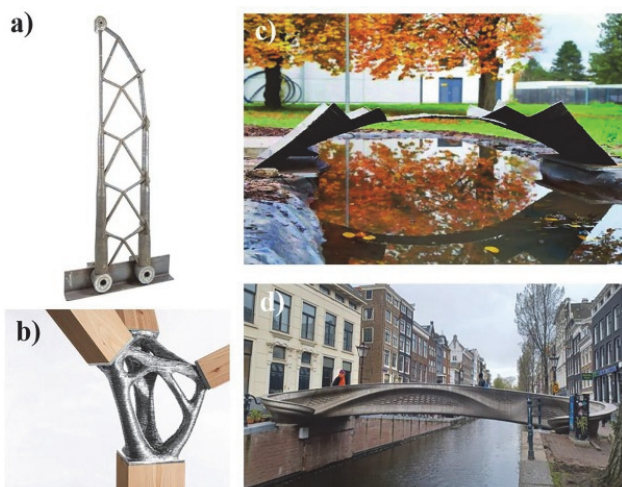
Successful examples illustrating the potential of WAAM in steel construction. a) Truss structure with optimised member sizes; b) connection of spatial shells; c) the bridge in Darmstadt; d) MX3D bridge in Amsterdam [5]
